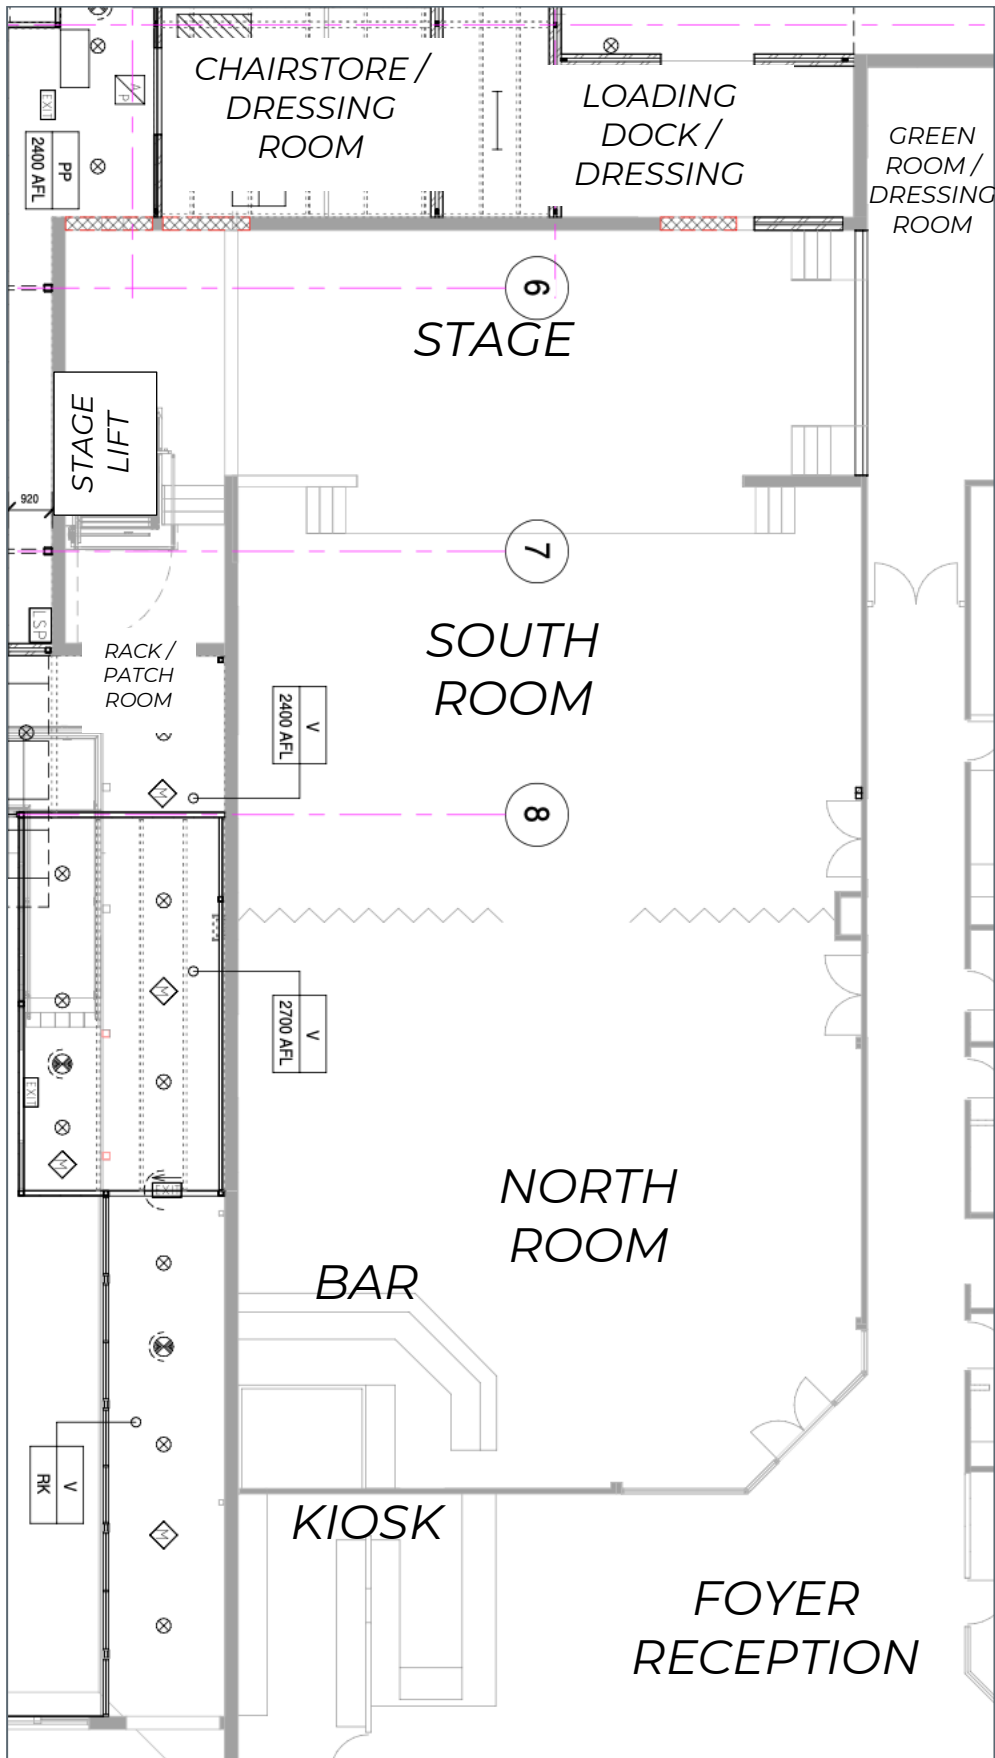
Venue floor plan (per 2020 upgrades) – not to scale
